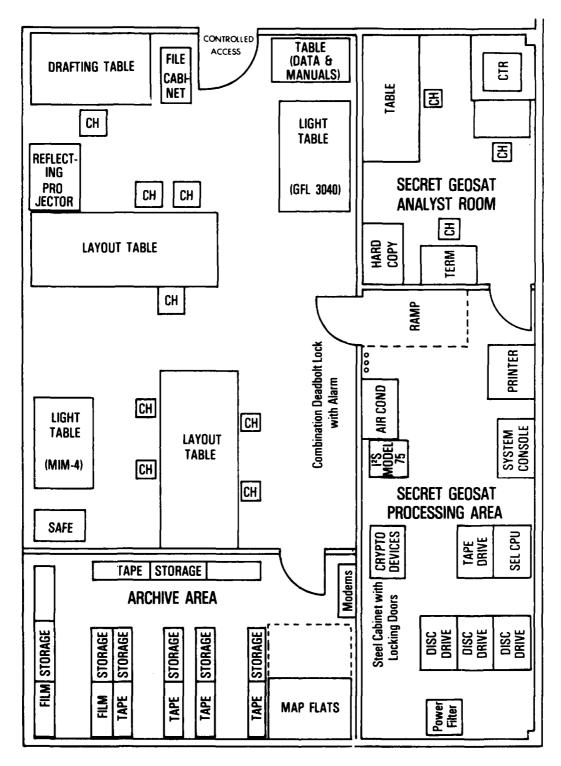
Floor plan for NORDA GOAP processing facility.
